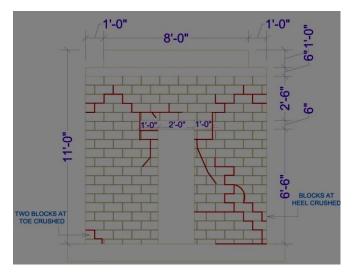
Crack Pattern for Unreinforced Block Masonry Wall at a Story Drift of 0.53 %(16mm)
